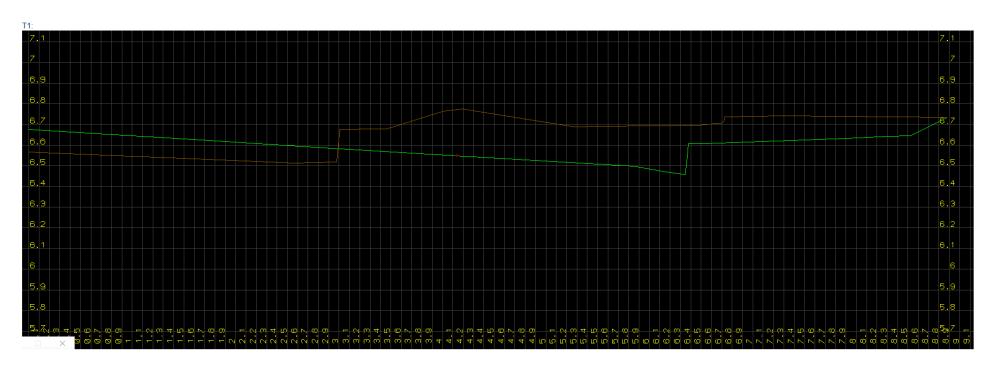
T1 - Brown line denoted existing ground level, green line is proposed/finished ground level, red cross is tree location.
